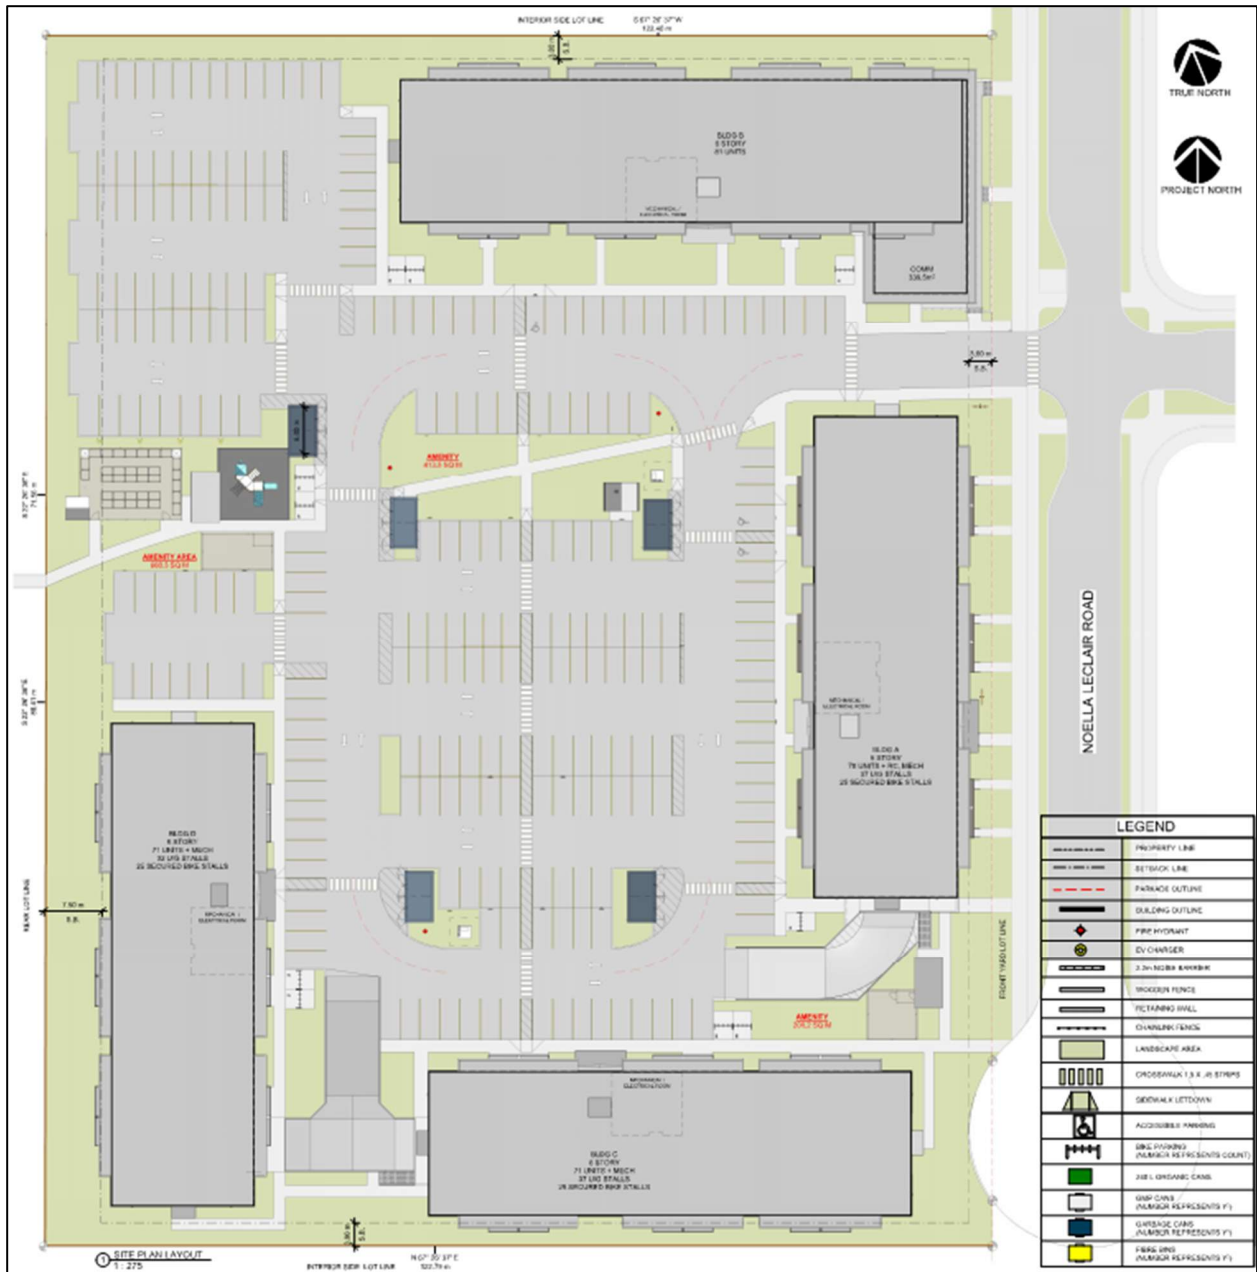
Excerpt of Site Plan dated May 2023 (full version submitted with the application)
